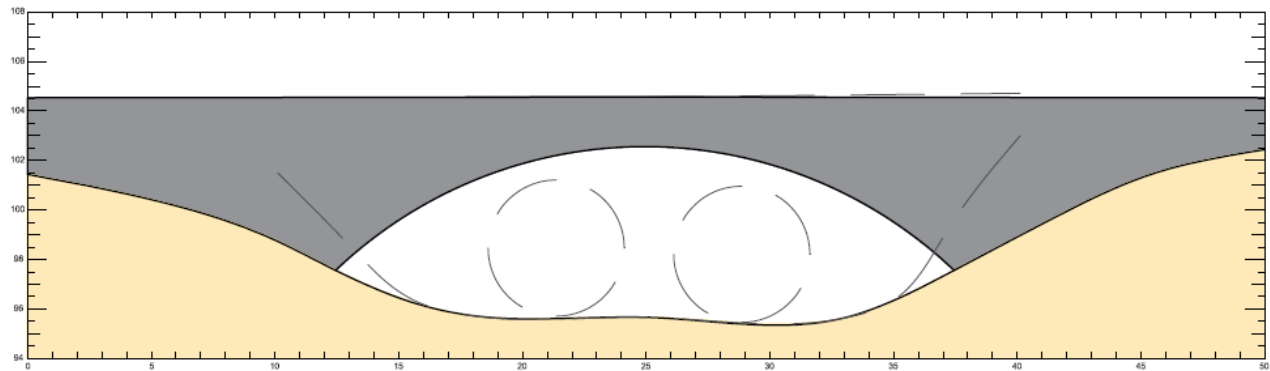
Design schematic of the open-bottom arch culvert with the existing culverts superimposed with the dashed line. Measurements are in feet.
